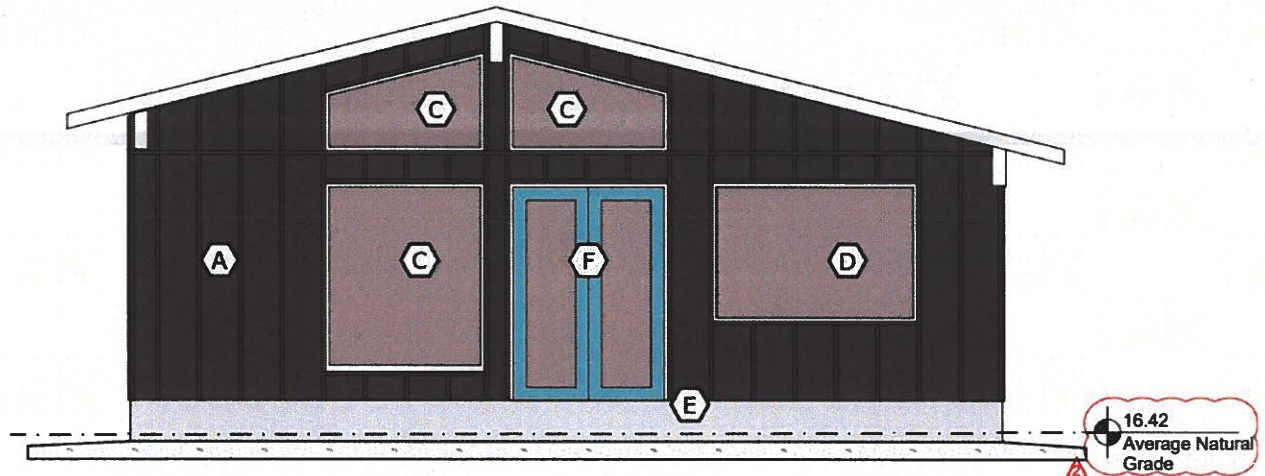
West Elevation (from plans by House Behind the Hedge Design Build)
